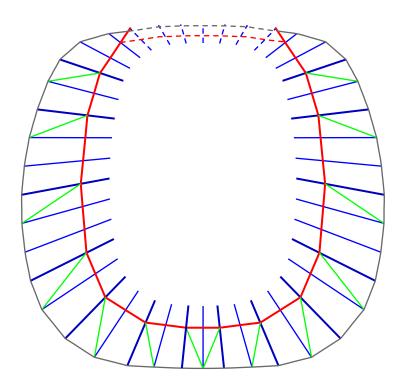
Plan view of structure showing Primary (red), Secondary (green), Tertiary (blue) and Edge (grey) truss locations.
